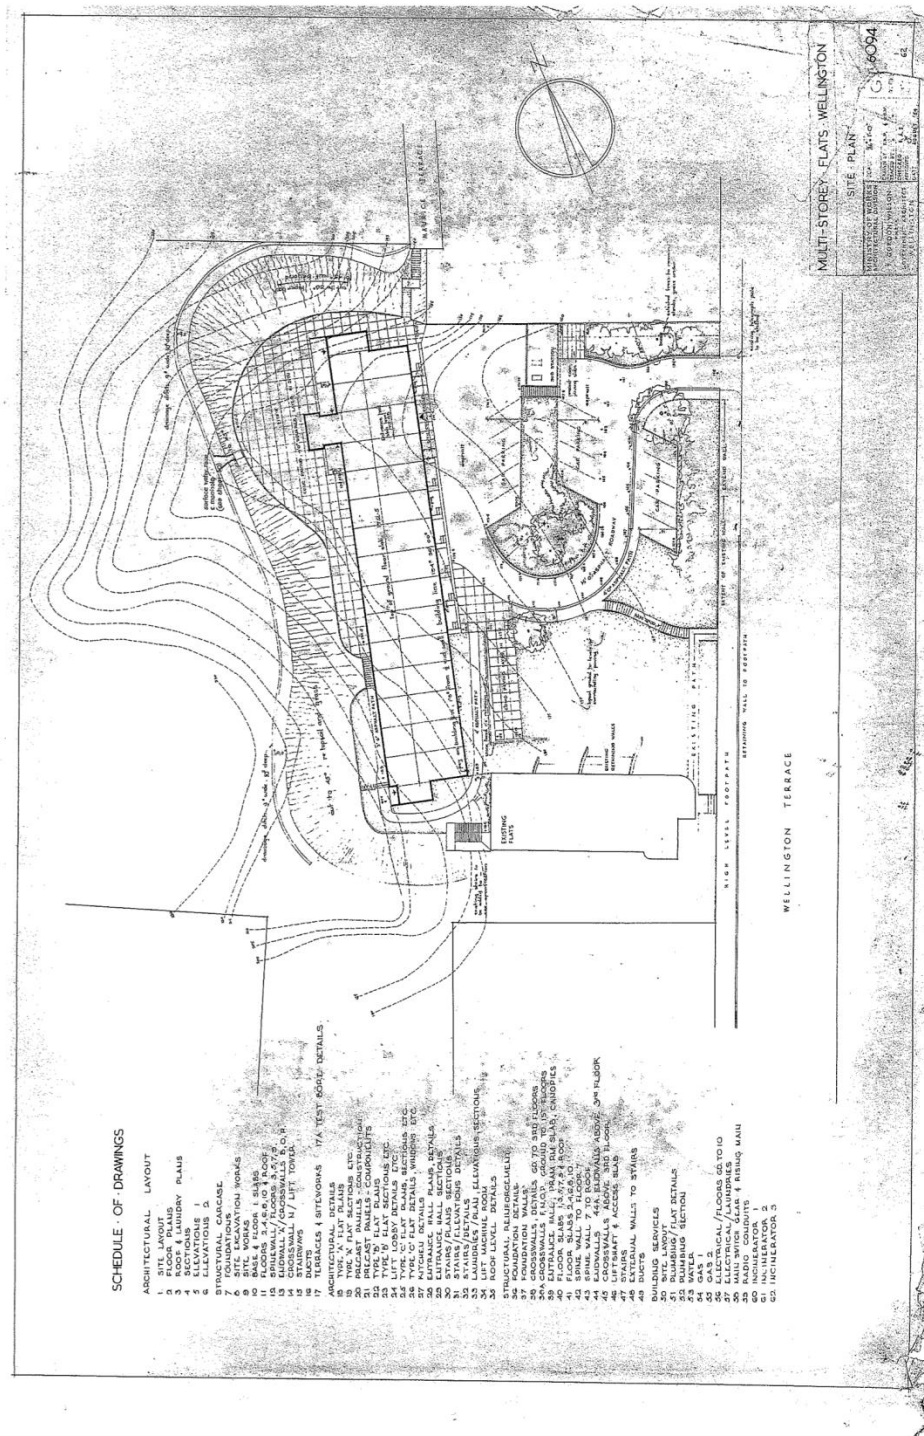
Site Plan and Schedule of Drawings, Gordon Wilson Flats; sourced from Archifact report, Appendix 3
